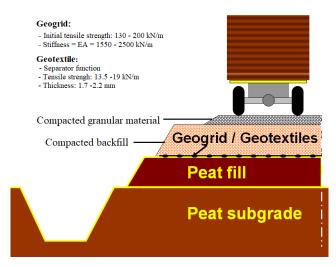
Construction of road embankment over peat swamps (Courtesy of PT Multibangun Rekatama Patria).
